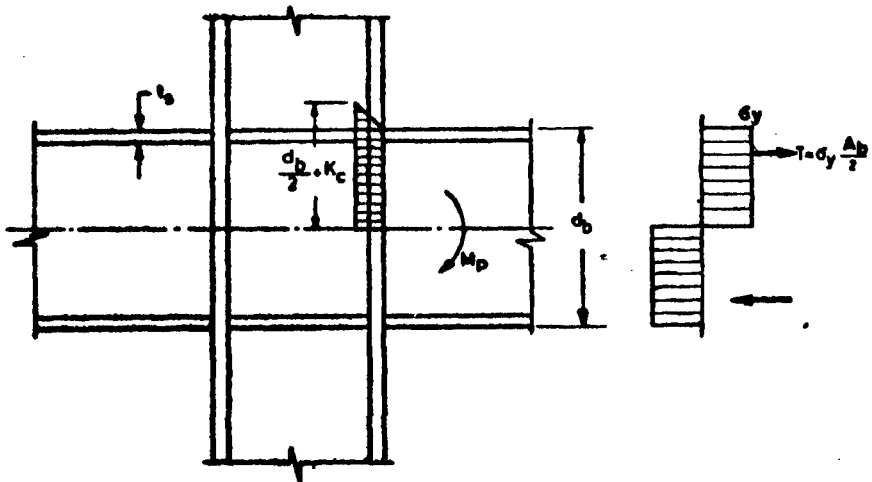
ASSUMED STRESS DISTRIBUTION IN BEAM TO COLUMN CONNECTION WITH FLANGE TYPE STIFFENER
